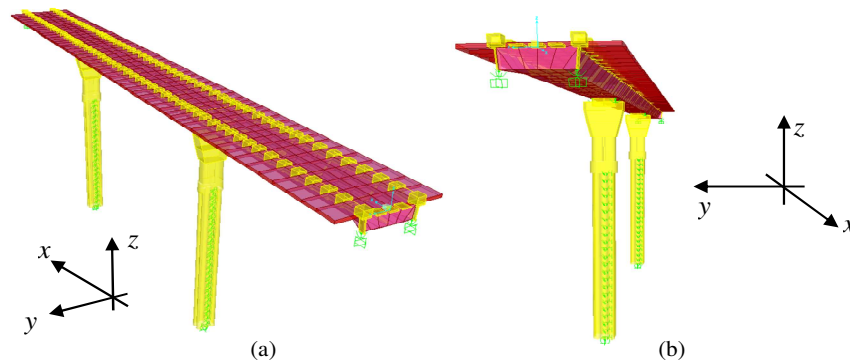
Conventional model of “Cesano bridge”: (a) global view, (b) detail of one pier
